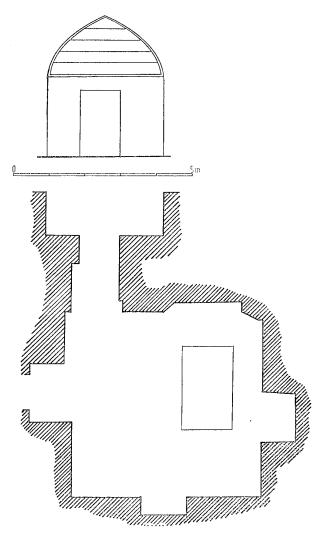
Qum, Šāhzāda Zayd, ground plan and elevation of portal.
